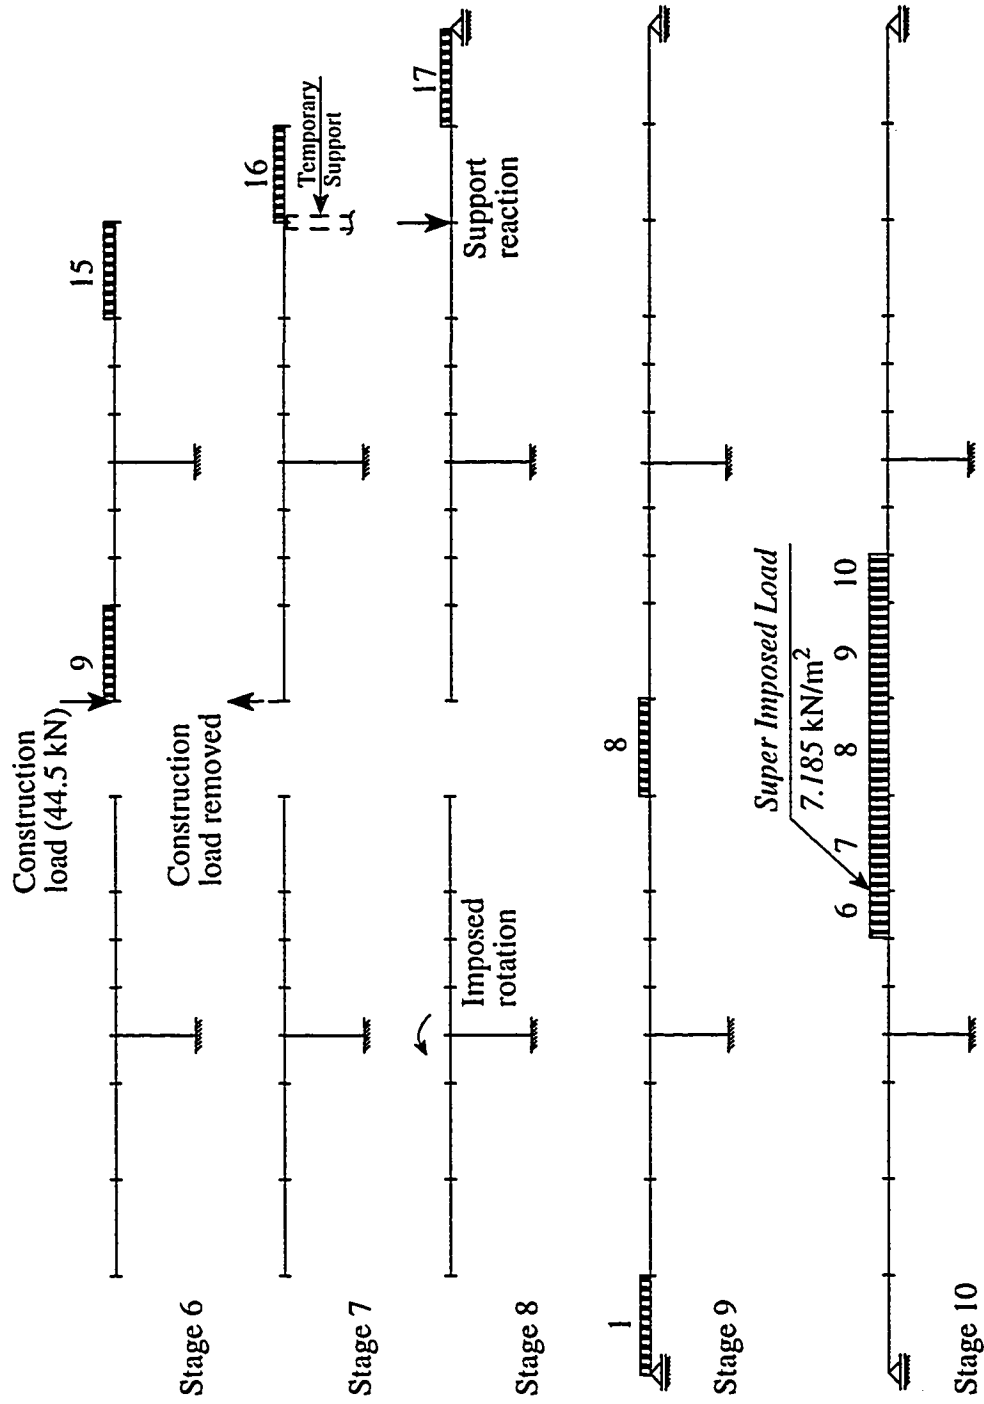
Construction Process for Bridge used in the Demonstration Example (Cont'd)
